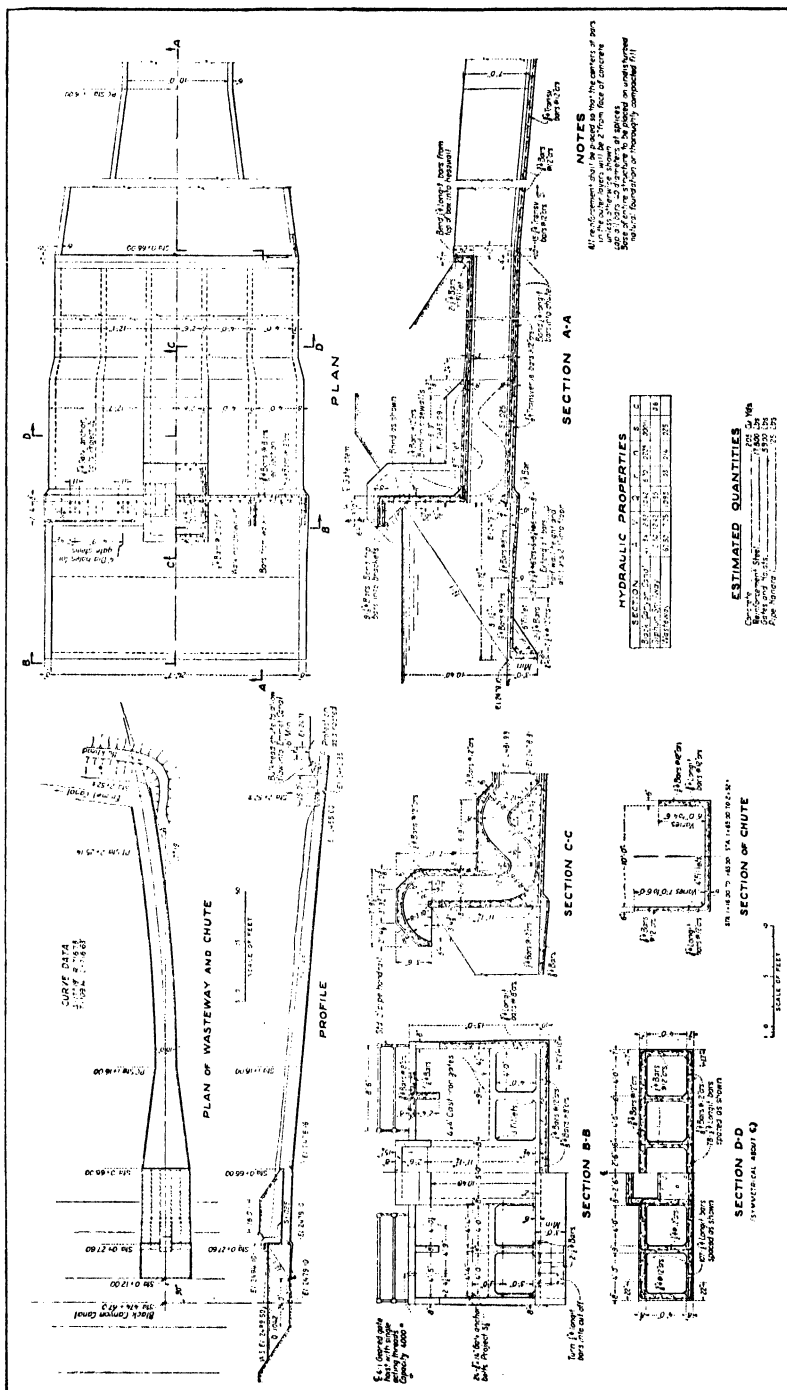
Wasteway structure with siphon spillway, Boise project, Idaho.
